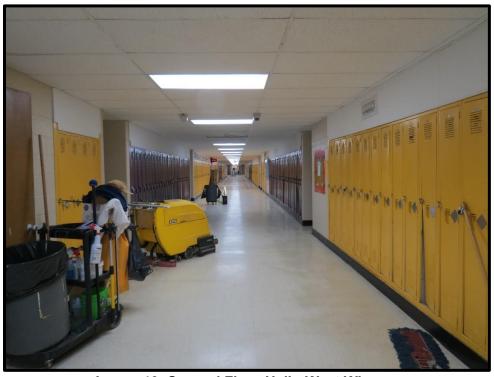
Second Floor Hall - West Wing (Photo taken on March 13, 2019)
